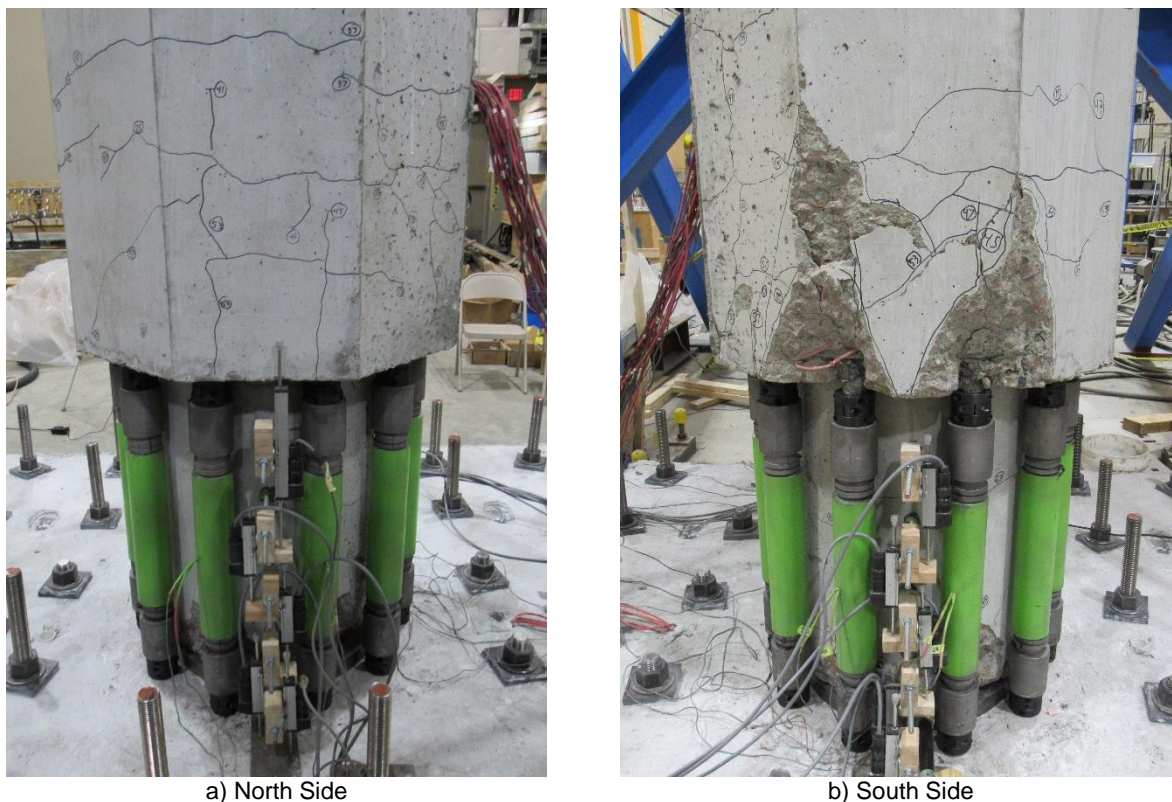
RPH-PC-R Column Plastic Hinge Damage before Retesting
